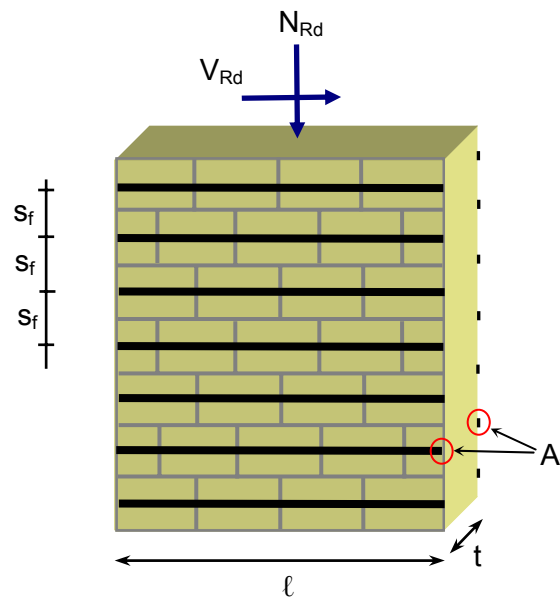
Masonry wall subjected to in-plane shear combined with axial compression.
